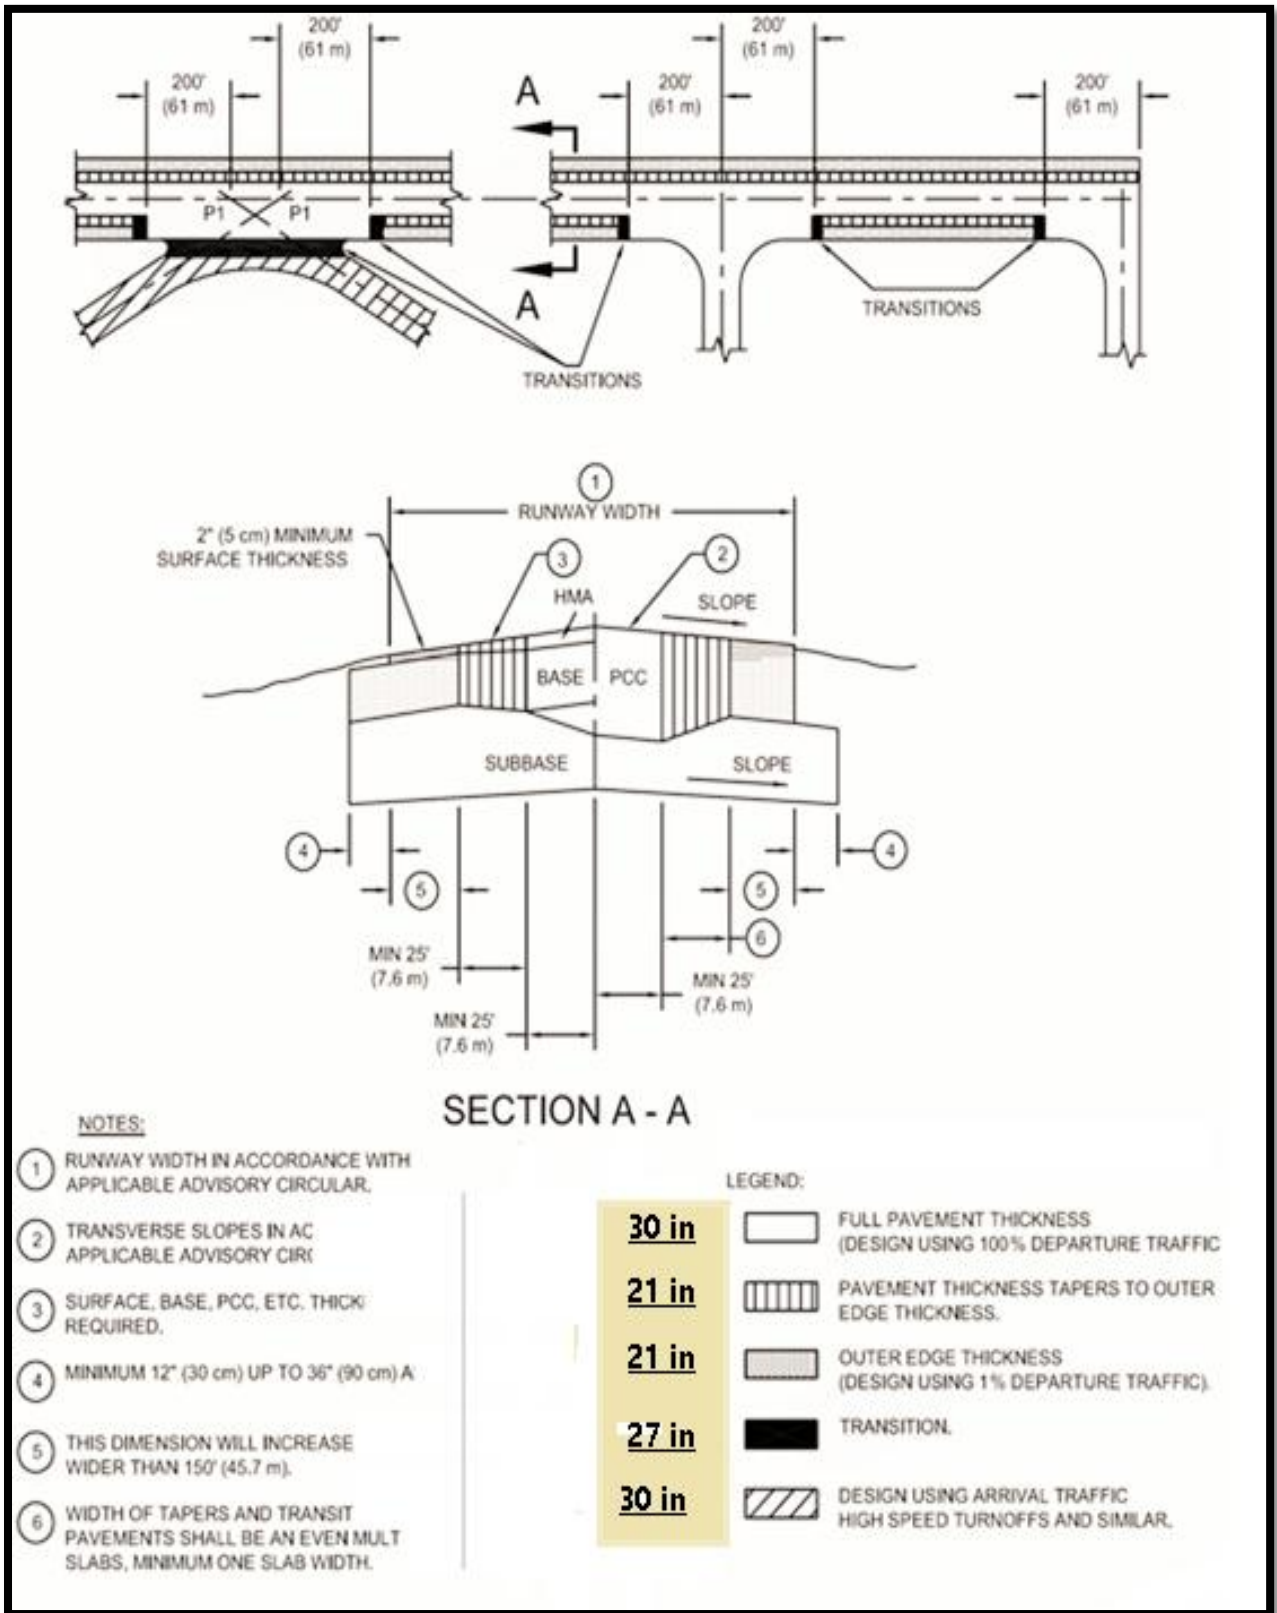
Typical Plan and Cross Section for KNIA Runway Pavement designed by AI (nomographs)
